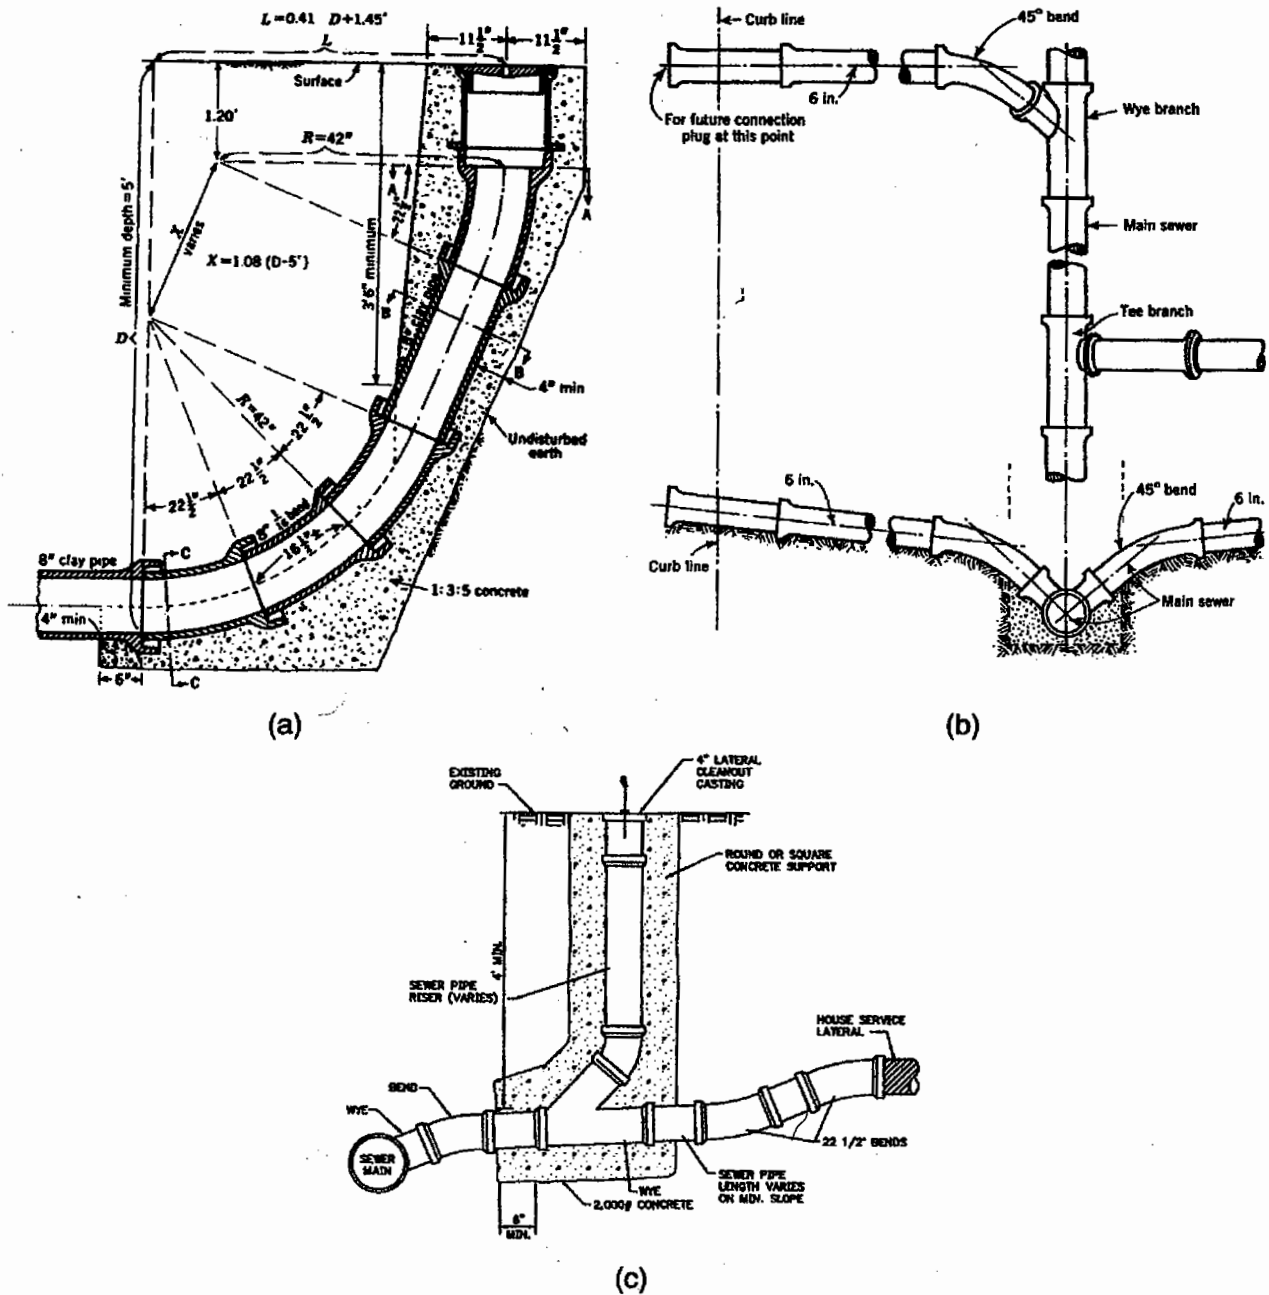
Typical Terminal Cleanouts and House Connections. 1 ft = 0.3048 m: (a) terminal cleanout (from Ref. 13; used with permission of National Clay Pipe Institute); (b) service connections for shallow sewer (from Ref. 11; used with permission of Water Environment Federation and American Society of Civil Engineers); (c) lateral sewer and house service lateral (courtesy Chiang, Patel & Yerby, Inc.).
